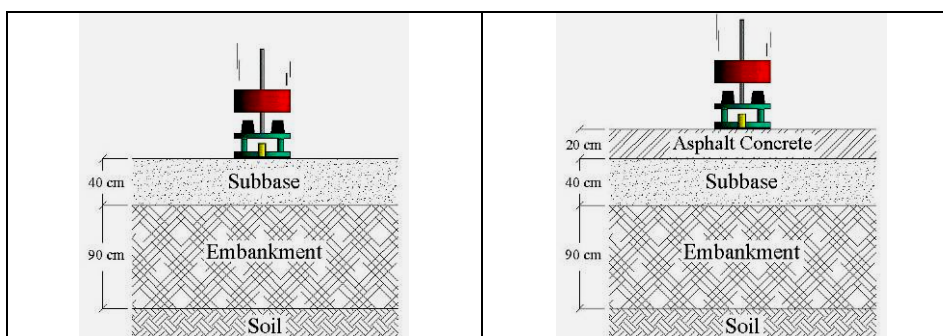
Test site nr. 3, structures tested (without and with asphalt concrete)
